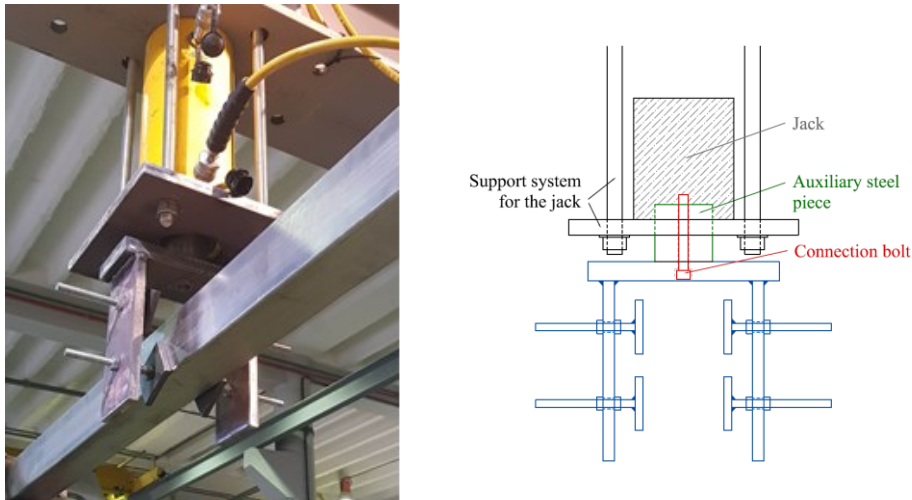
General view and details of the vertical loading section auxiliary elements and their connection to the jacks.
